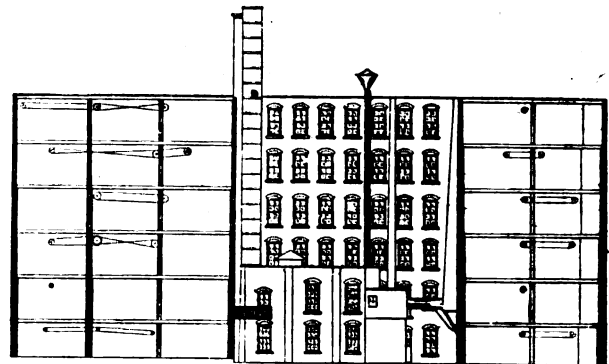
SECTION OF BUILDING SHOWING MOTOR DRIVING.
